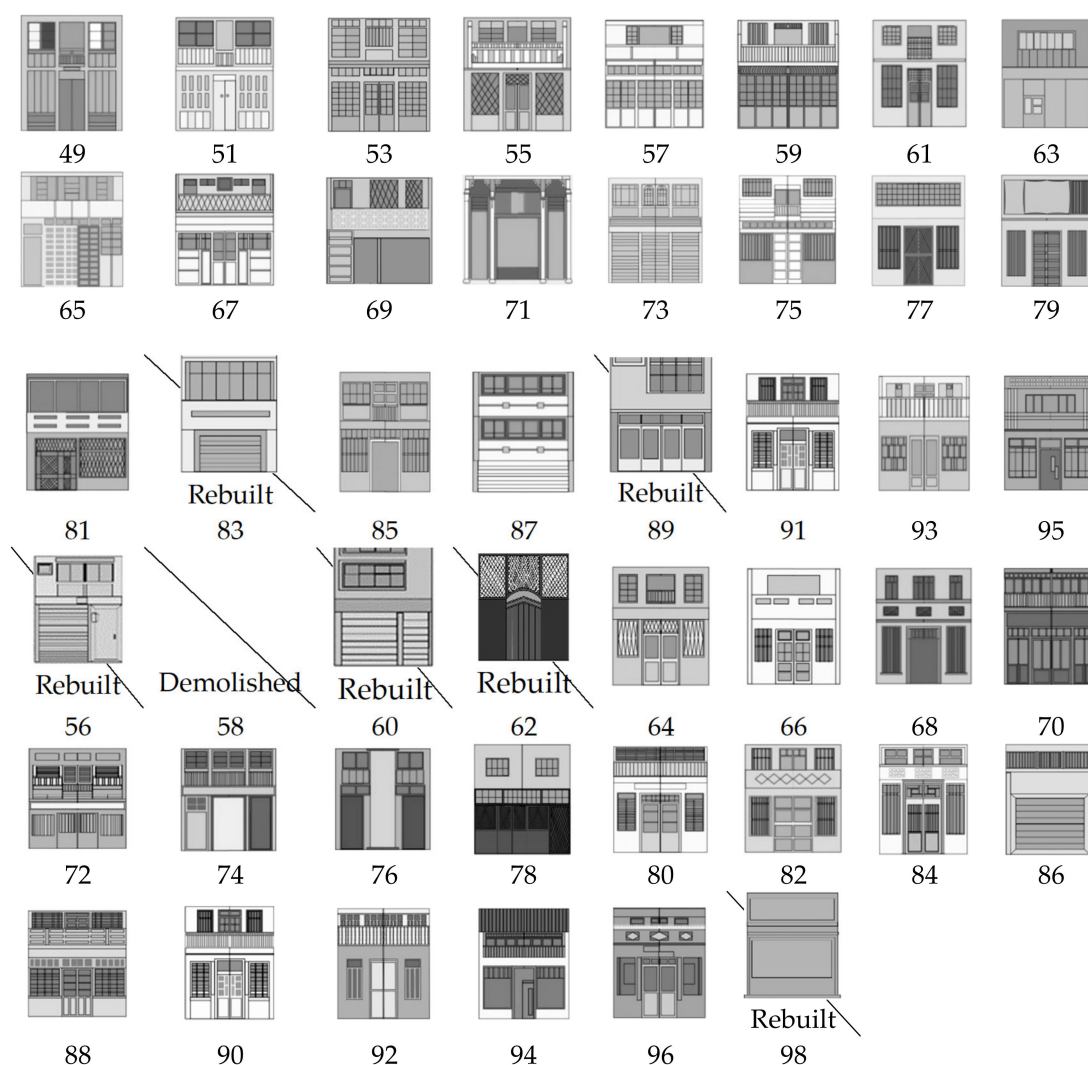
The facade styles of buildings on north and south side. (Adapted from [18]).
